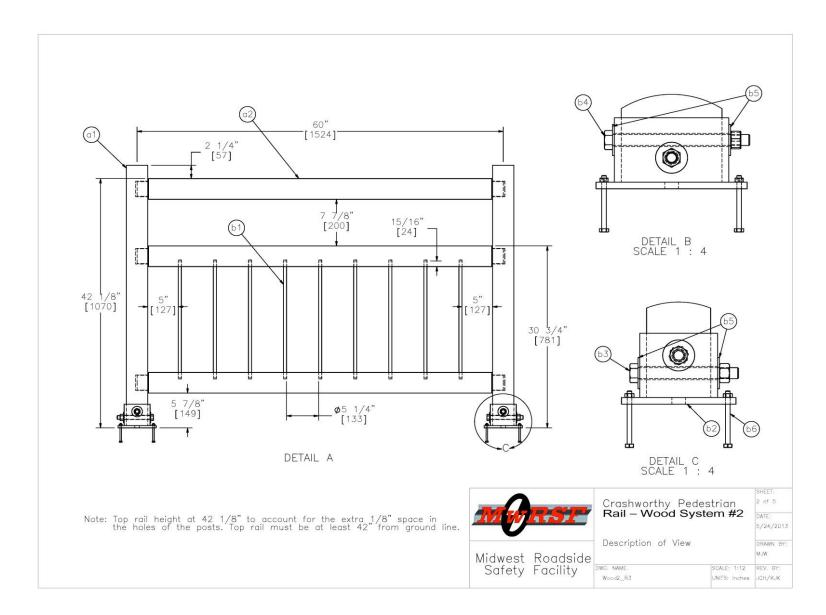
Cutout Wood Rail, Design Concept WOOD2 (Sheet 2 of 5)
